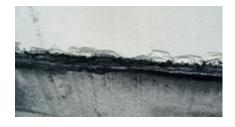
Groove along parapet wall to tuck in edge of membrane.
